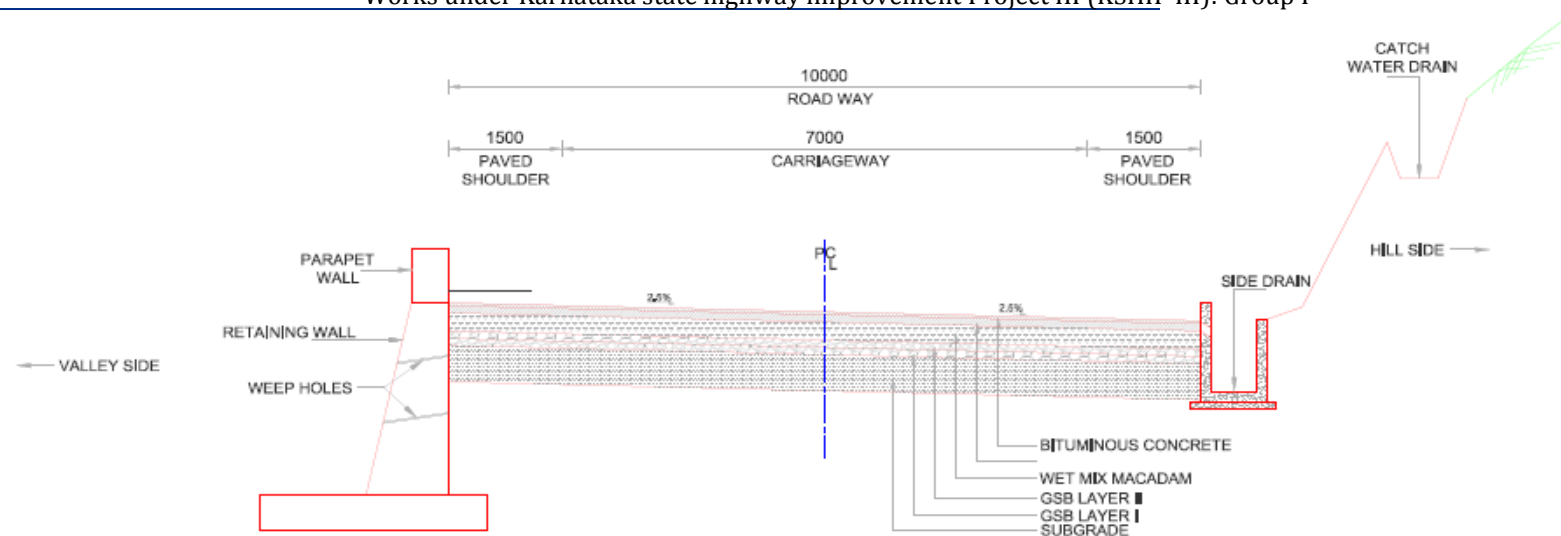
TCS-10 Two lane Carriageway with retaining wall in Hill/Ghat section
